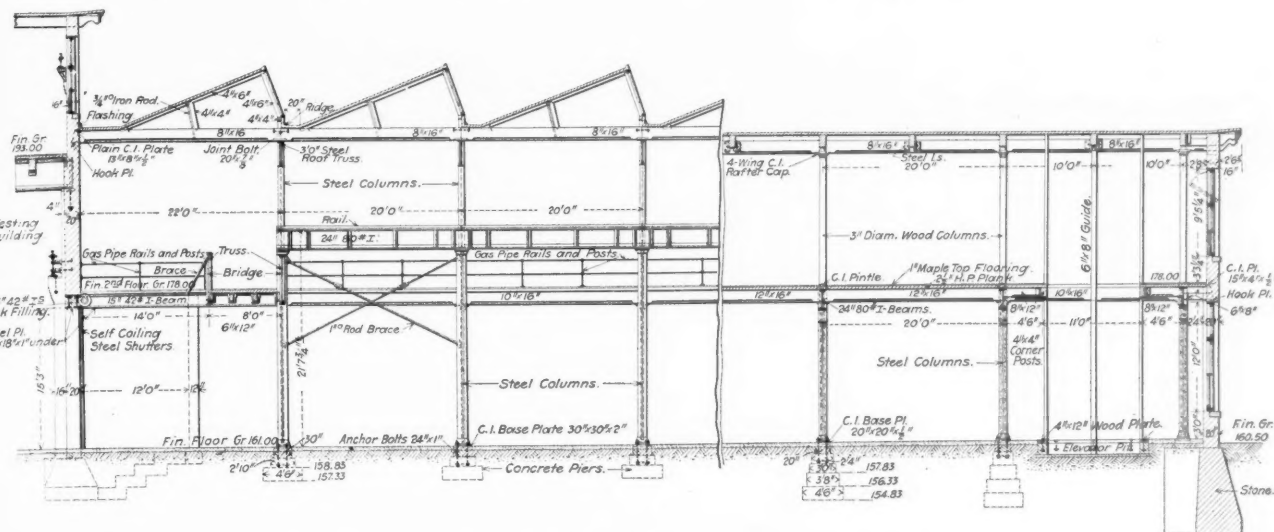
Longitudinal Sections of the Central Portion of the Machine Shop, showing Saw-tooth Roof, and also of one of the Gallery Sections.
